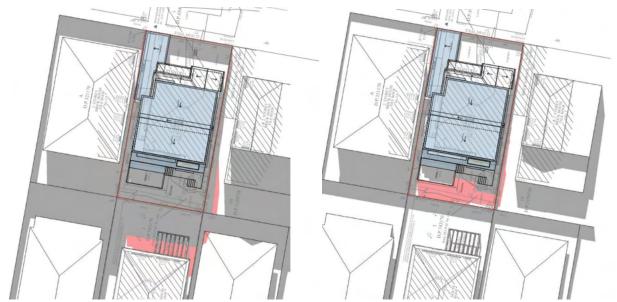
Proposed shadow diagrams. Left plan at 12pm on June 21 and the right plan at 12pm on 21 September.
